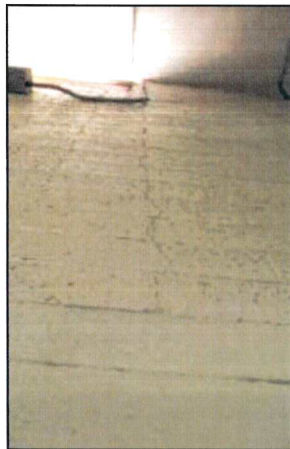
Fire Station #1* Carpet in the living area hallway is worn and stained.
